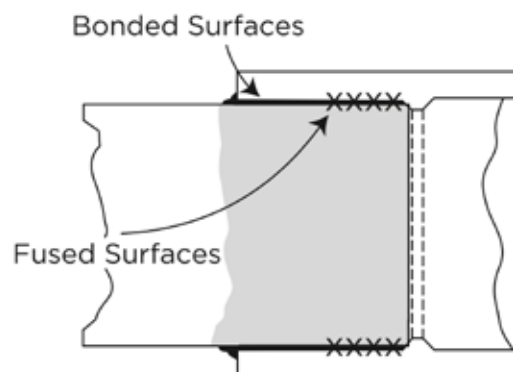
Fused and bonded surfaces of joined pipe and fitting.
